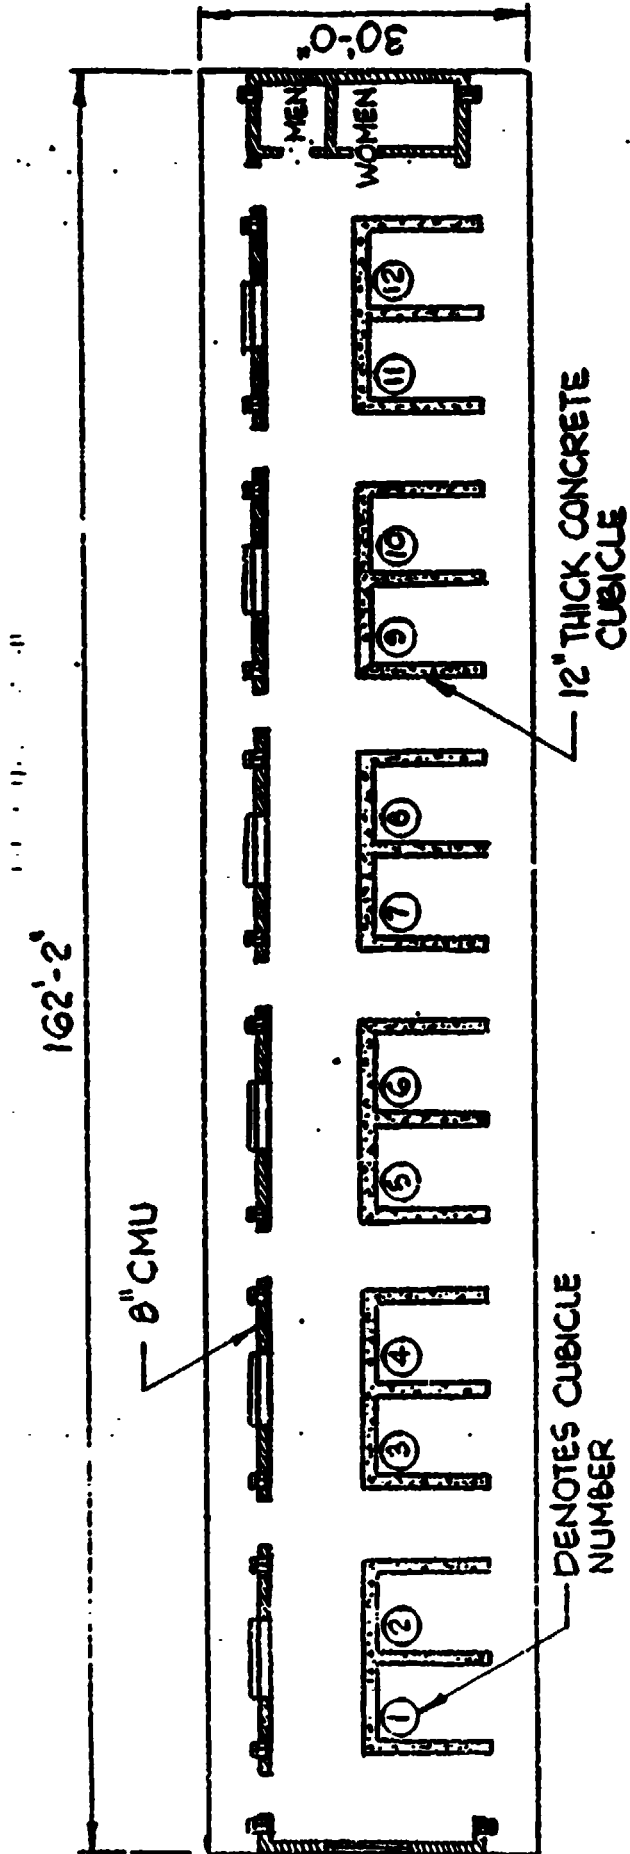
Typical 12" Reinforced Concrete Dividing Wall
